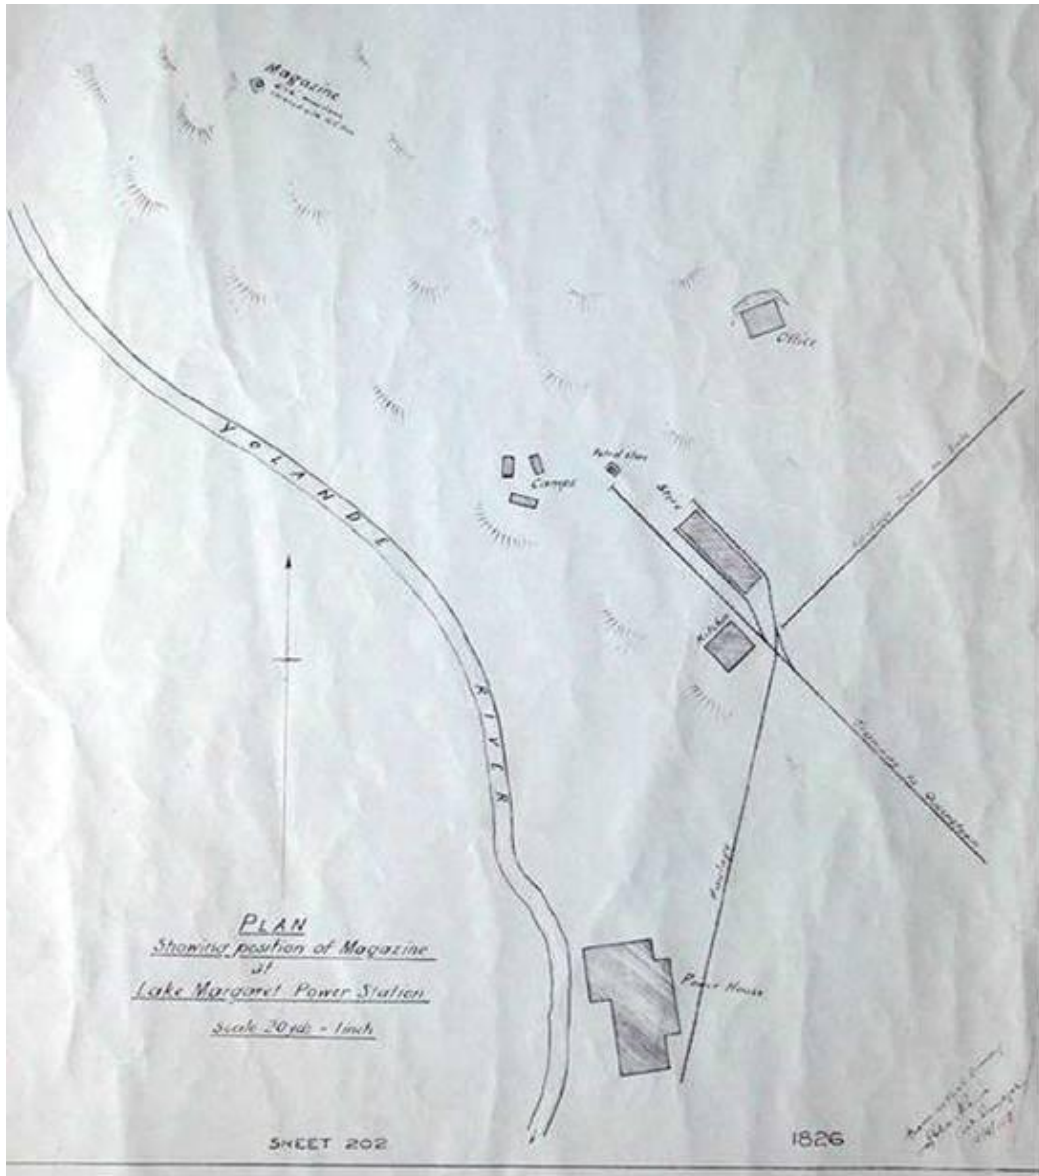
Site plan showing upper station, tramway and haulageway with associated buildings including the magazine, office, petrol store and camp
